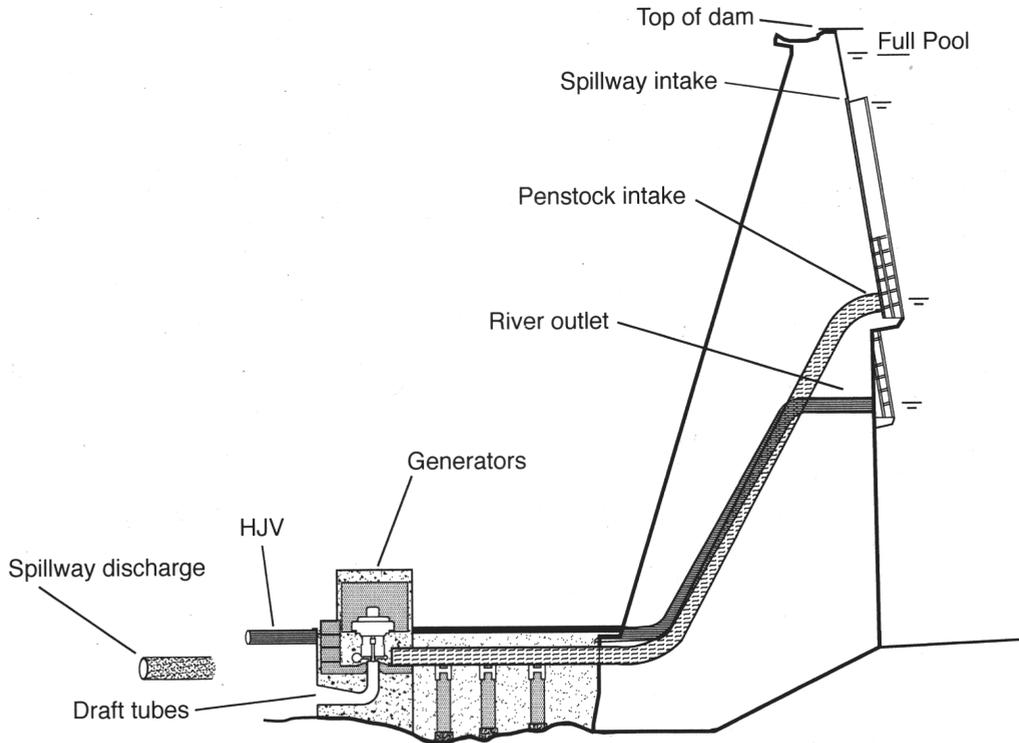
Structure of Glen Canyon Dam with location and discharge capacity of outlet structures. Top of dam elevation = 1132.3 m; full pool elevation = 1127.8 m; dam base elevation = 958.6 m; spillways inlet elevation = 1111.9 m, outlet elevation = 962.3 m, maximum discharge (Q_{\max}) = 5891 m³/s; penstocks inlet elevation = 1057.65 m, outlet elevation = 947.6 m, Q_{\max} = 892–940 m³/s; river outlet works (ROW) inlet elevation = 1028.4 m, hollow jet valve (HJV) outlet elevation = 967.7 m, Q_{\max} = 425–566 m³/s.
